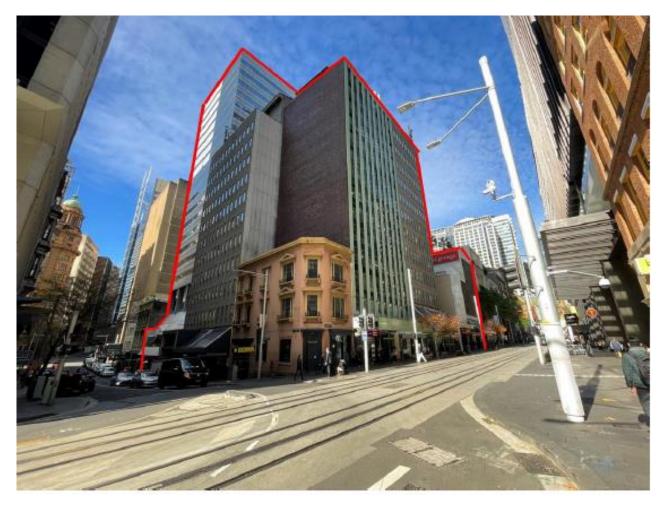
Photo of Existing Development at Western Site (Source: Planning Proposal)
